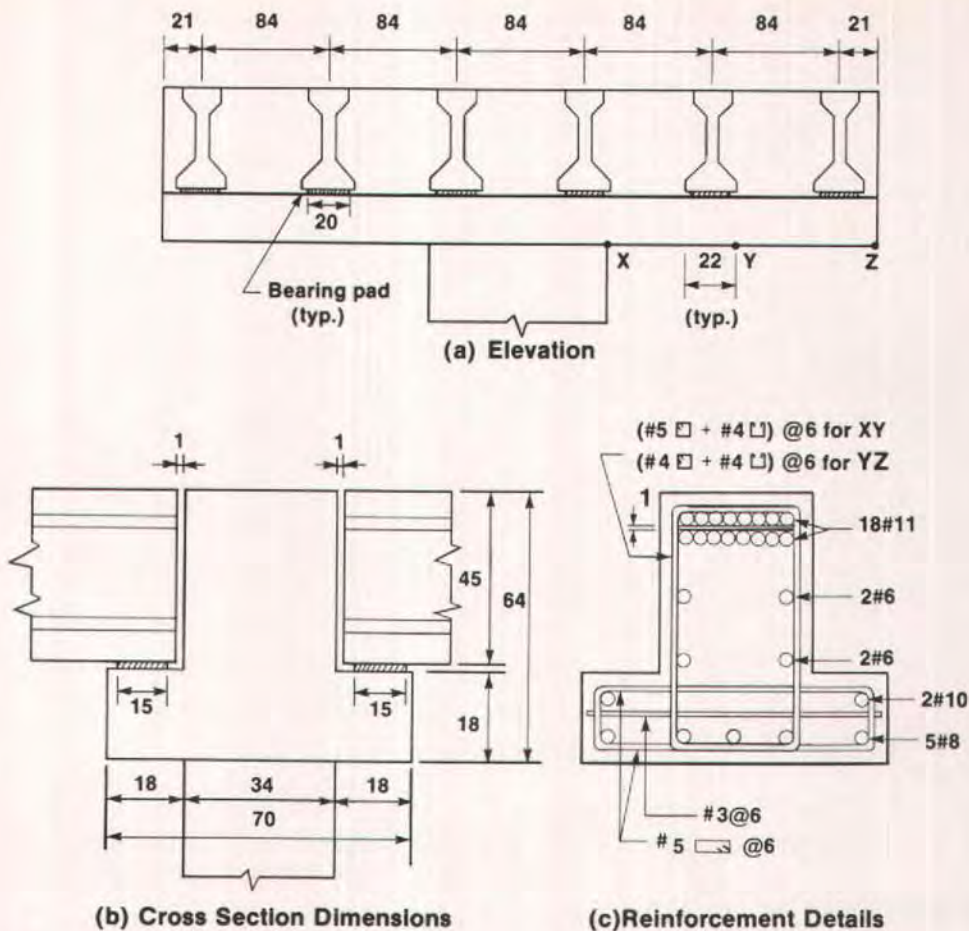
Details of an inverted T beam designed in the example (all dimensions are in inches; 1 in. = 25.4 mm).
